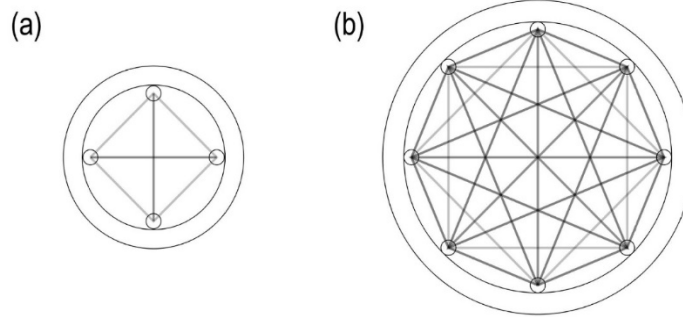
Drilled shaft cross-sections showing access tubes and ray paths for (a) small-diameter shaft with four access tubes and (b) large-diameter shaft with eight access tubes. From Boeckmann and Loehr (2018).
